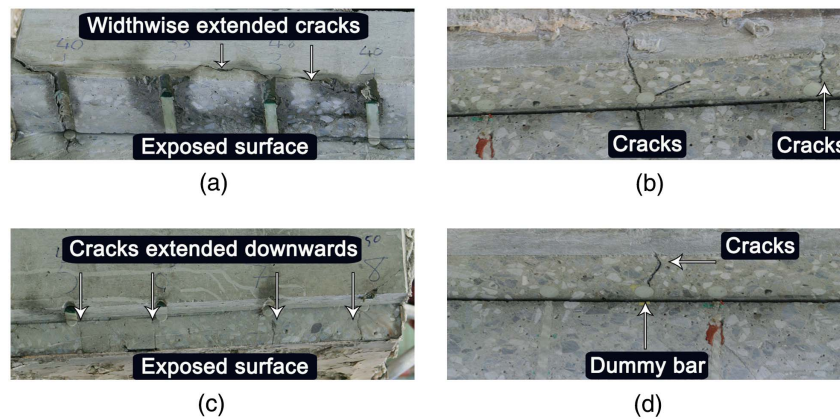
(a) Widthwise crack; (b) crack initiation around the bars; (c) cracks extended downward; and (d) cracks around the dummy GFRP bar after test investigations of Slab-B.
